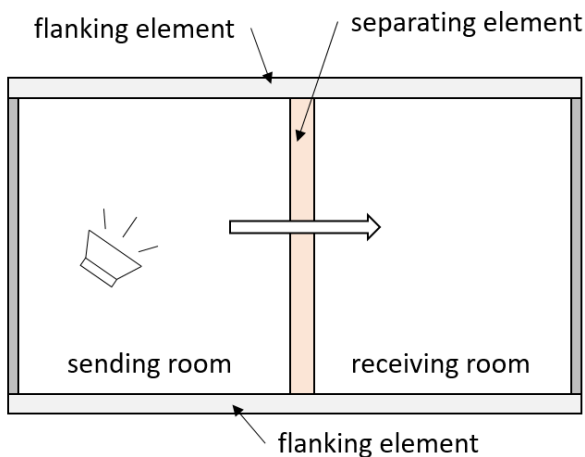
Schematic representation of the separating element and the flanking elements: a standard, rectangular wall has 4 flanking elements: 2 walls and 2 slabs (floor and ceiling)
